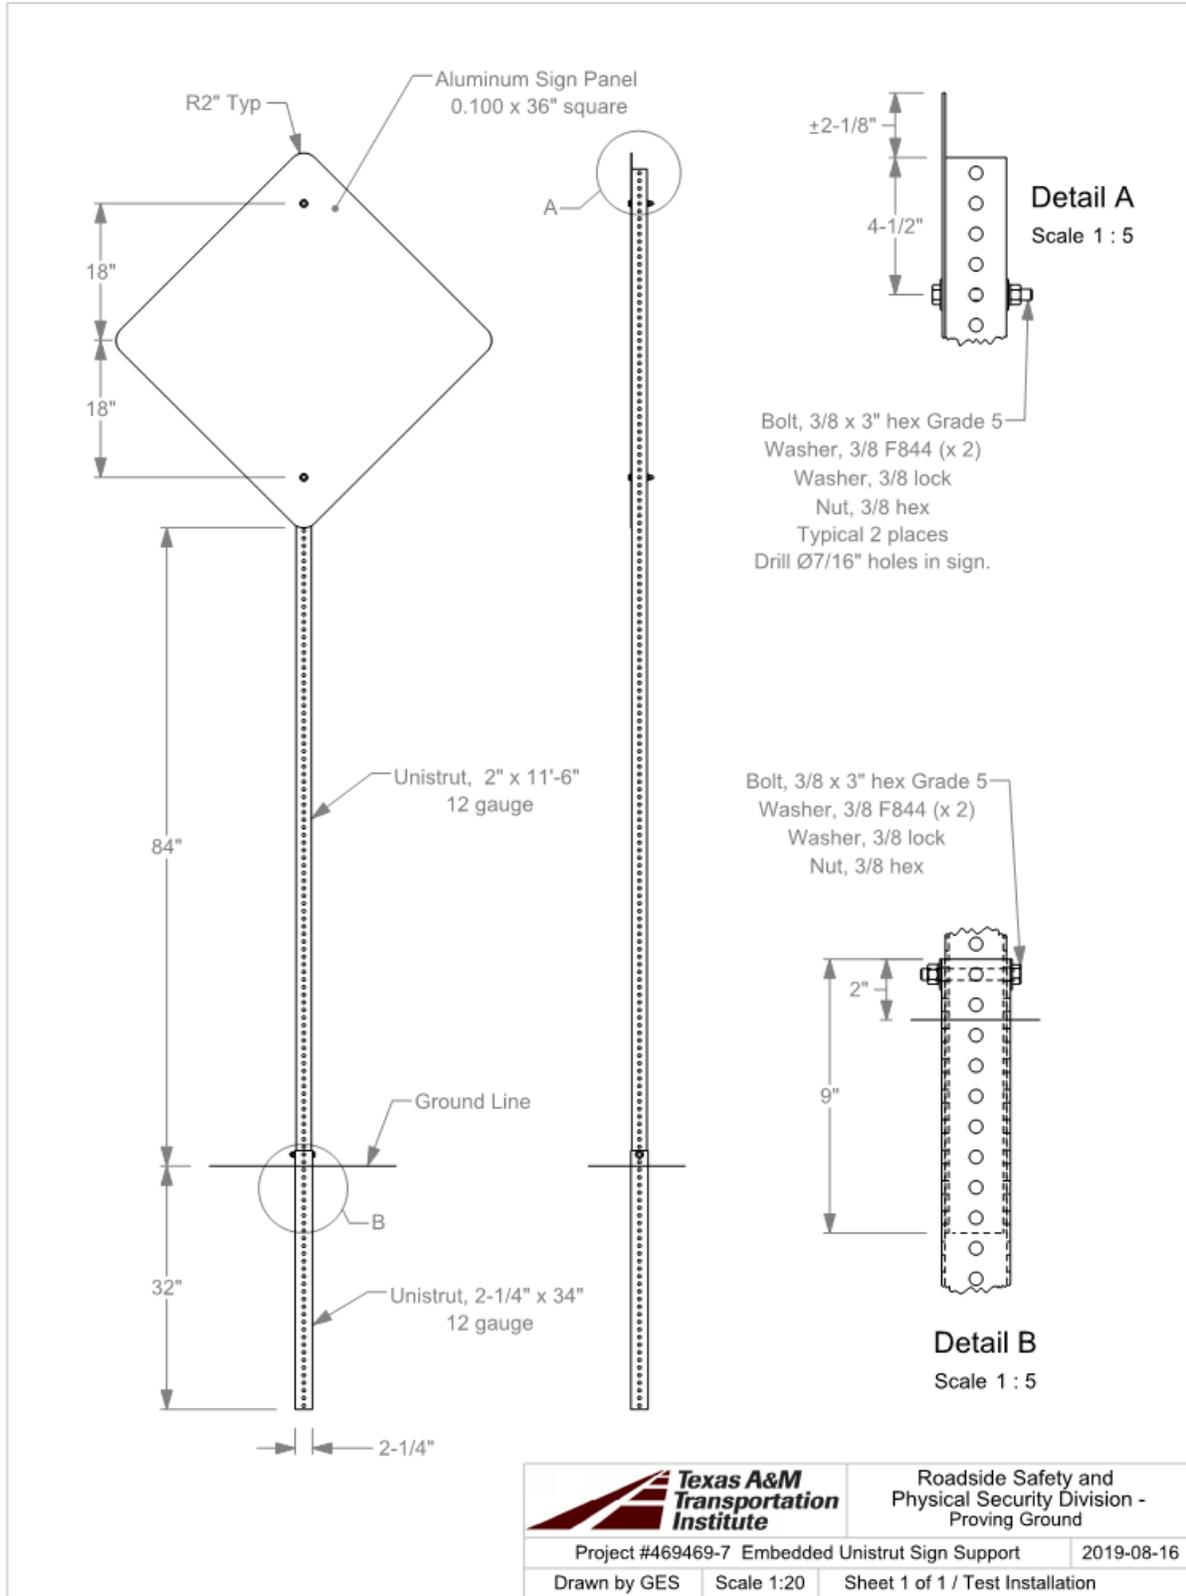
Overall Details of the PSST Sign Support in Anchor Stub System for Text No. 469469-7-2.
